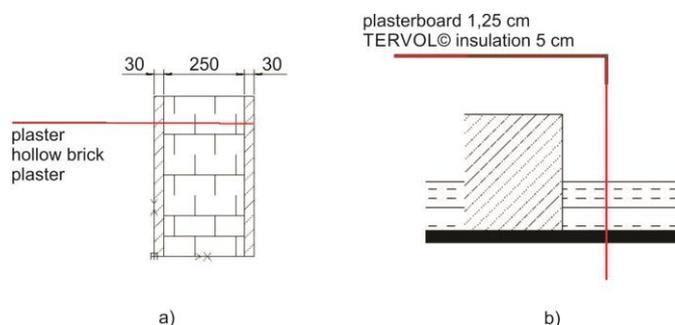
Cross section of construction - a) external wall with hollow brick; b) roof with plasterboard
